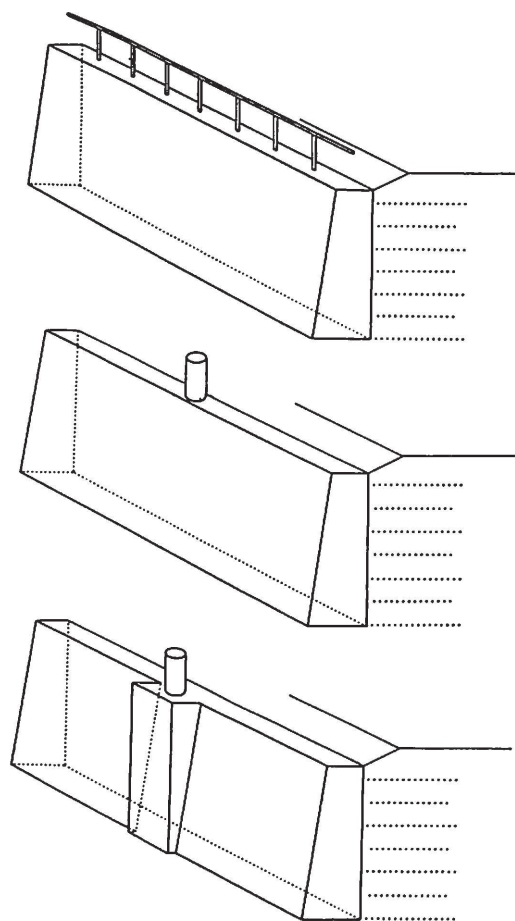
Some examples of full-height rigid facing of GRS retaining wall
